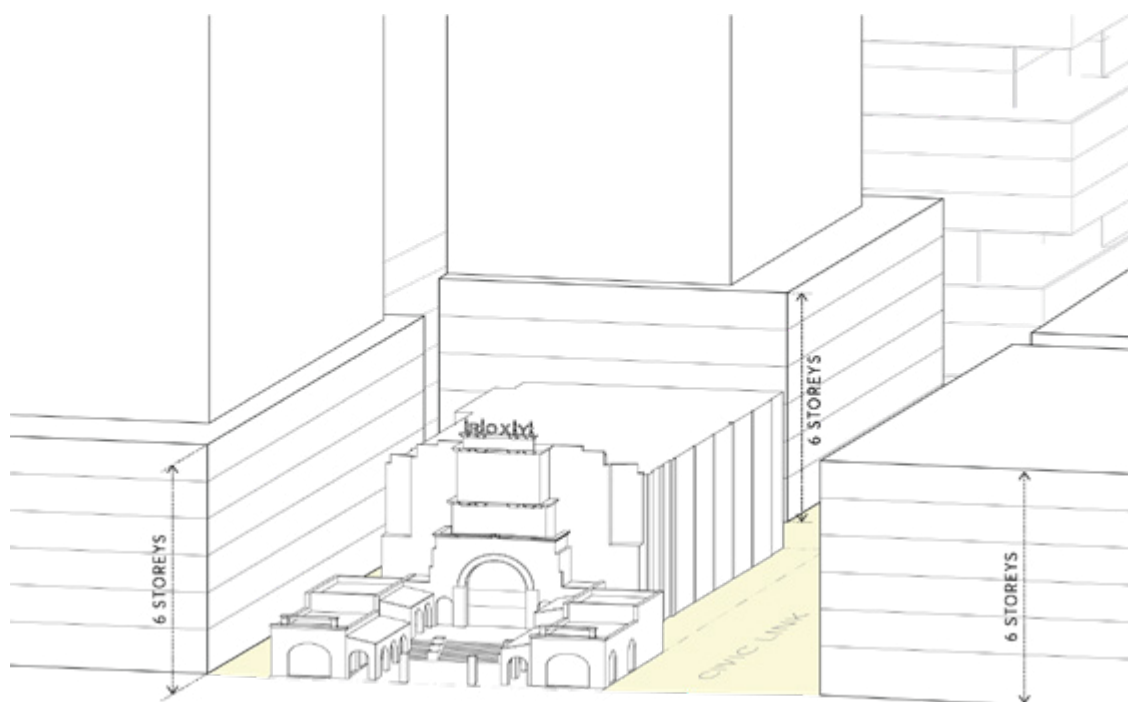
Street Wall Heights next to the Roxy
